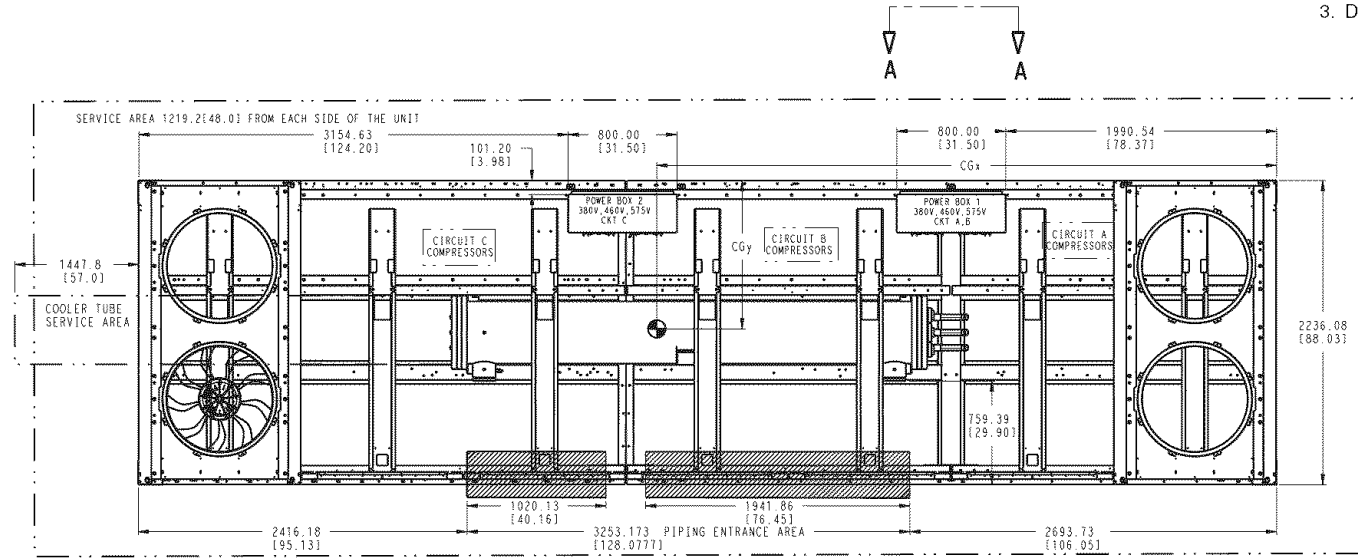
30RB210, 225 Air-Cooled Chiller Dimensions
